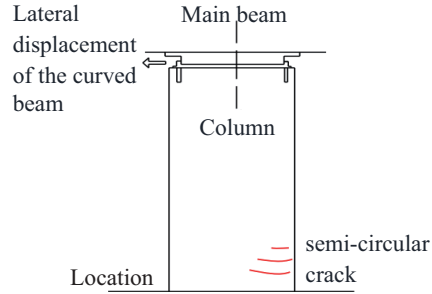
Schematic diagram of crack in bridge pier column
